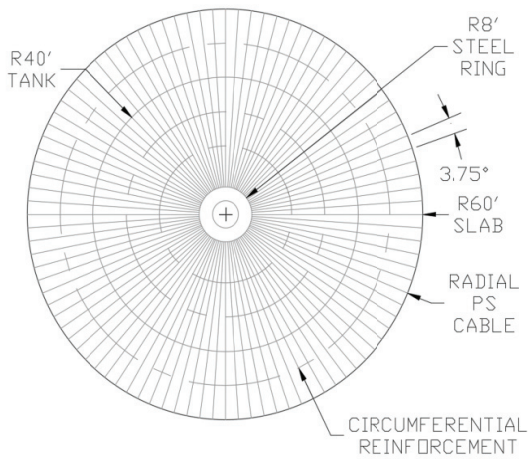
Posttensioning cable and circumferential reinforcement layout for the circular concrete slab including inner steel ring [10].
